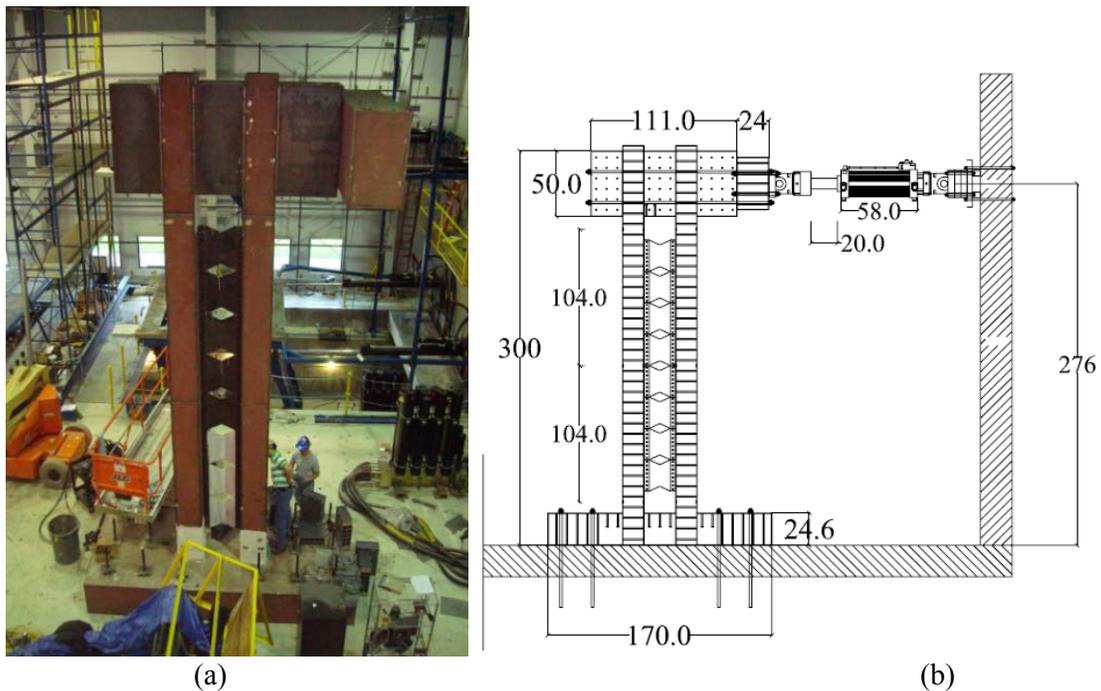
Experiment Setup (a) General View of the Experiment, (b) Bridge Pier with SPSLs
